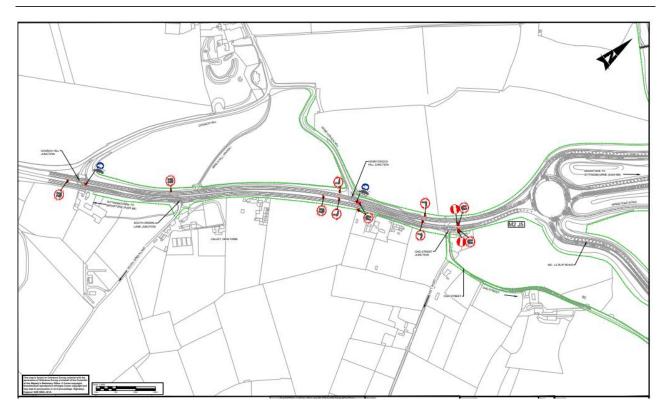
The existing road network depicting routes onto A249 from Stockbury village
